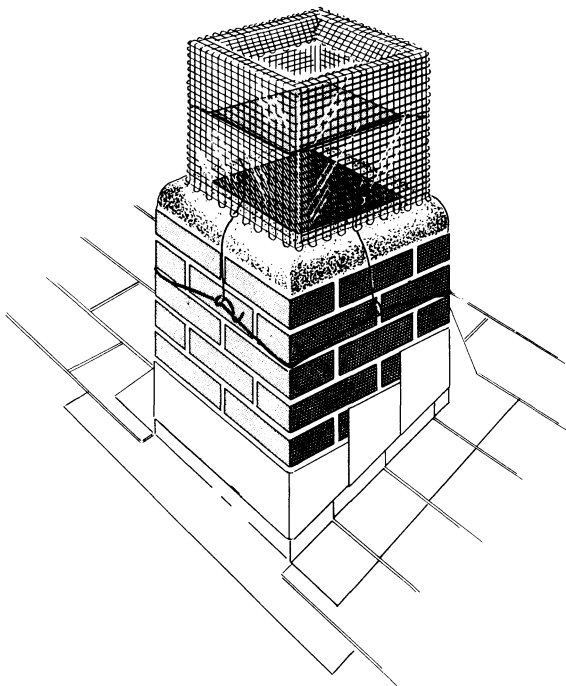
Install spark arresters on chimneys to prevent sparks from flying out and falling on the roof.
